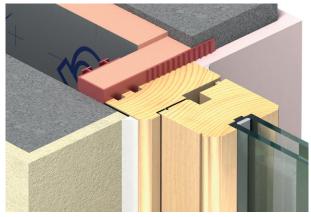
Kingspan Kooltherm® Cavity Closer at a check reveal
